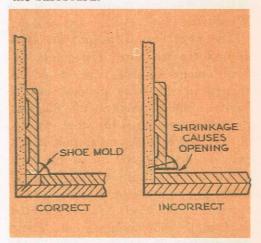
Correct and incorrect way to nail shoe mold in place. When the correct method of nailing is used, shrinkage at the baseboard or flooring will not expose any unsightly and dust-collecting cracks.
